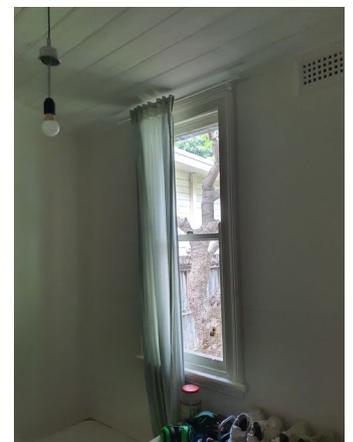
138: Original window and boarded ceiling to room off the living room.
